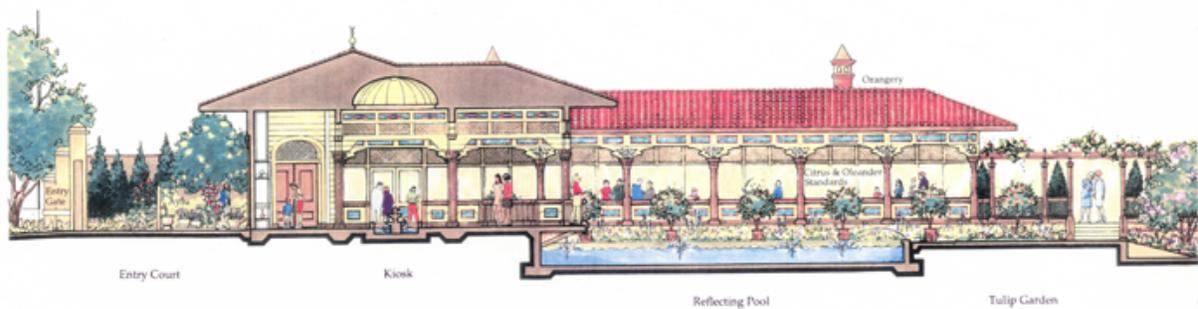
The Bakewell Ottoman Garden, first proposal. Section elevation part two (the reflecting pool and Tulip Garden). Source: Fazil Sütçü.
